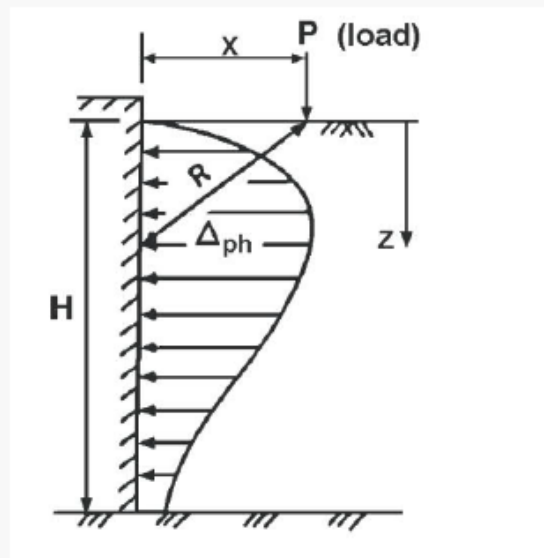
Horizontal Pressure on a Wall Caused by a Point Load
